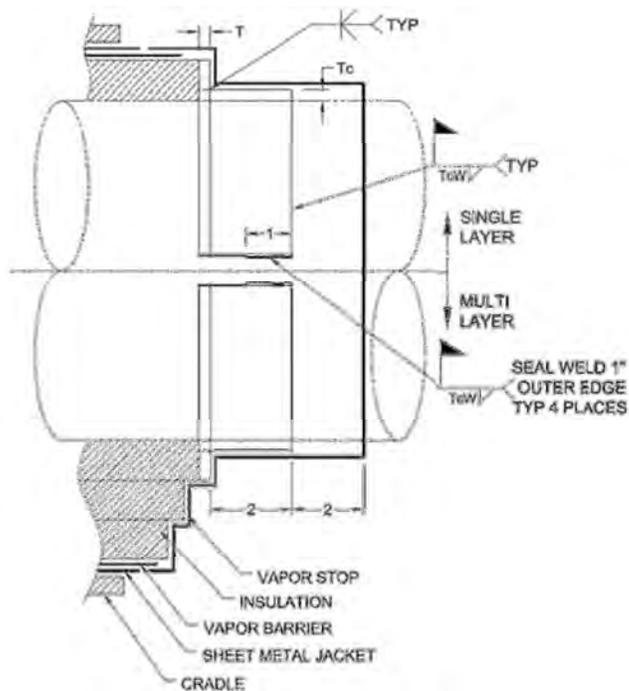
Axial Pipe Lug and Vapor Stop Detail (ANCHORS ONLY)
